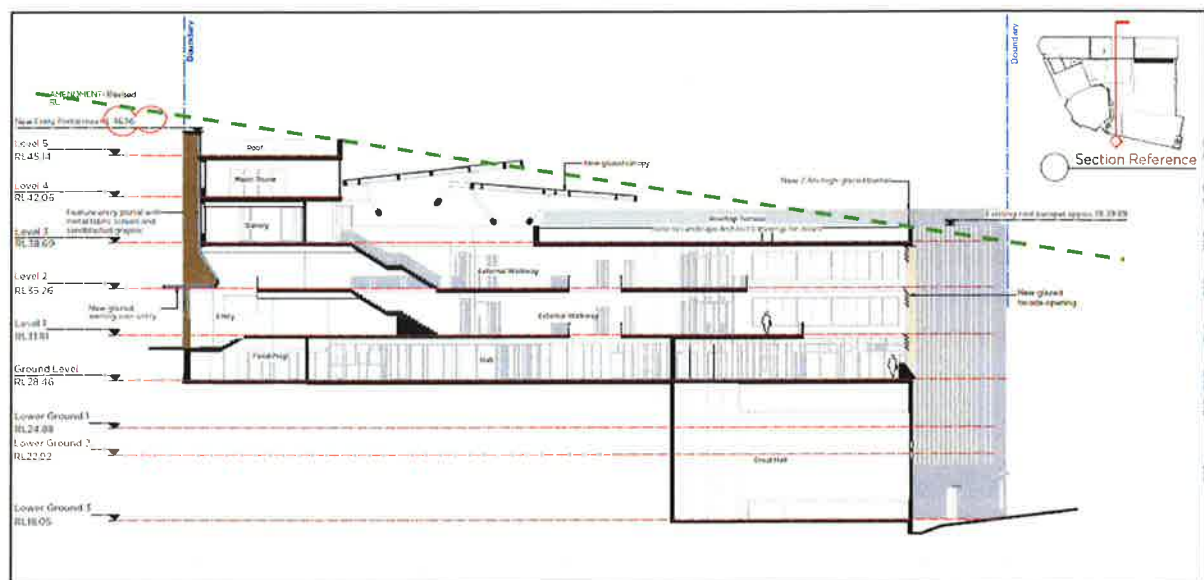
| Section through the Main Campus building (Source: Applicant's RtS 2018)
